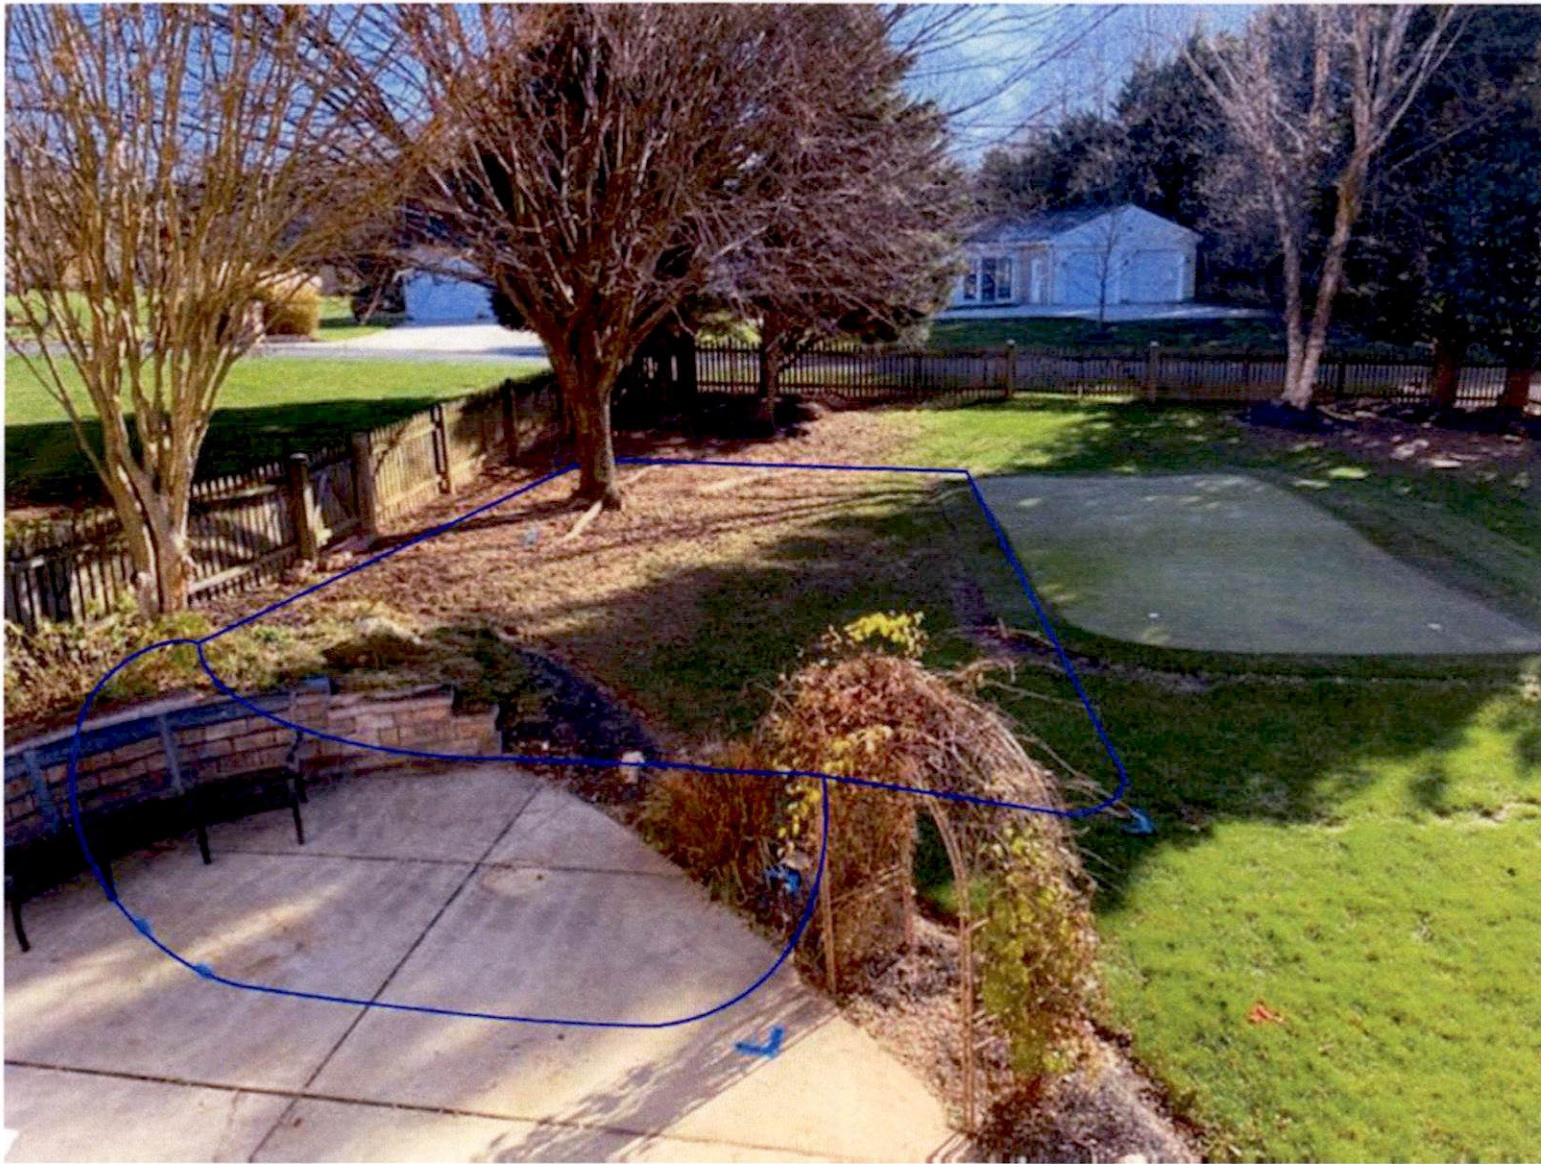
From Existing Raised Deck, Looking East towards Celtis Court
